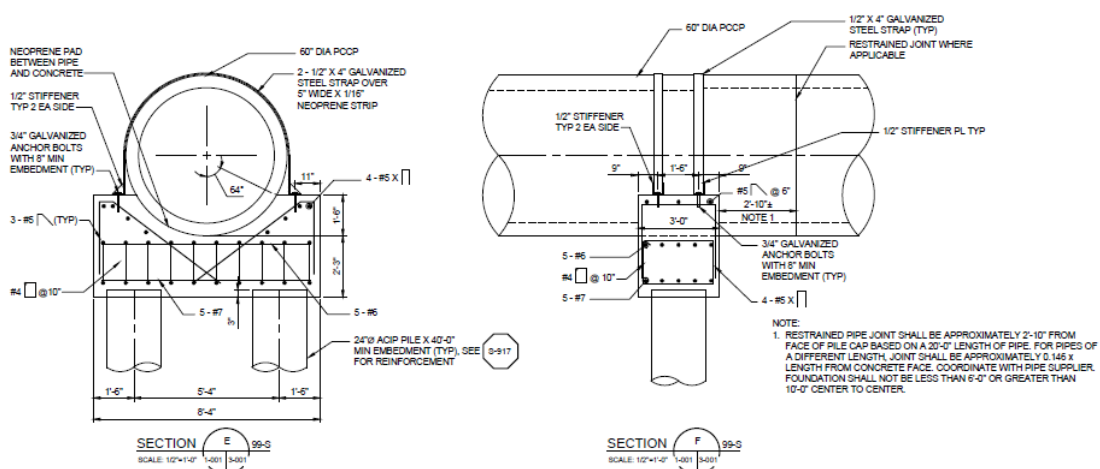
PCCP Secondary Effluent Conduit Foundation Detail
